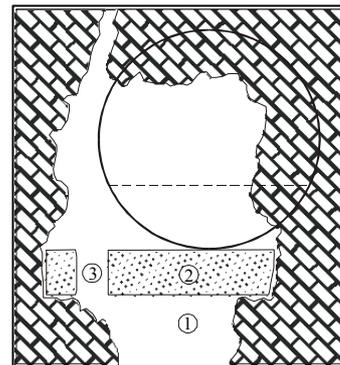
Cavern rehabilitation by bridging for a TBM drive (Milanović, 2000). 1. Cavern; 2. Concrete slab; 3. Aeration – drainage opening.
